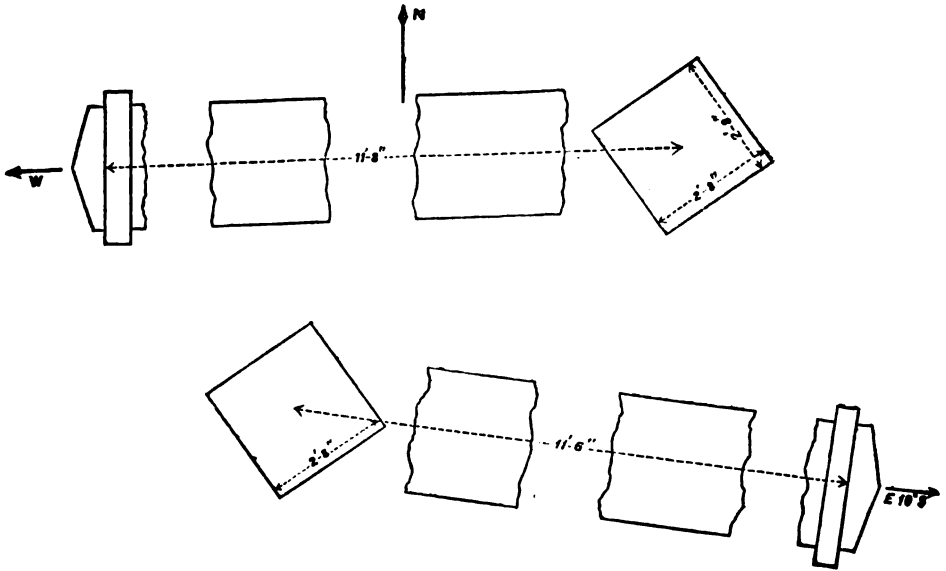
Plan of overthrown gate pillars at Gaubati.
